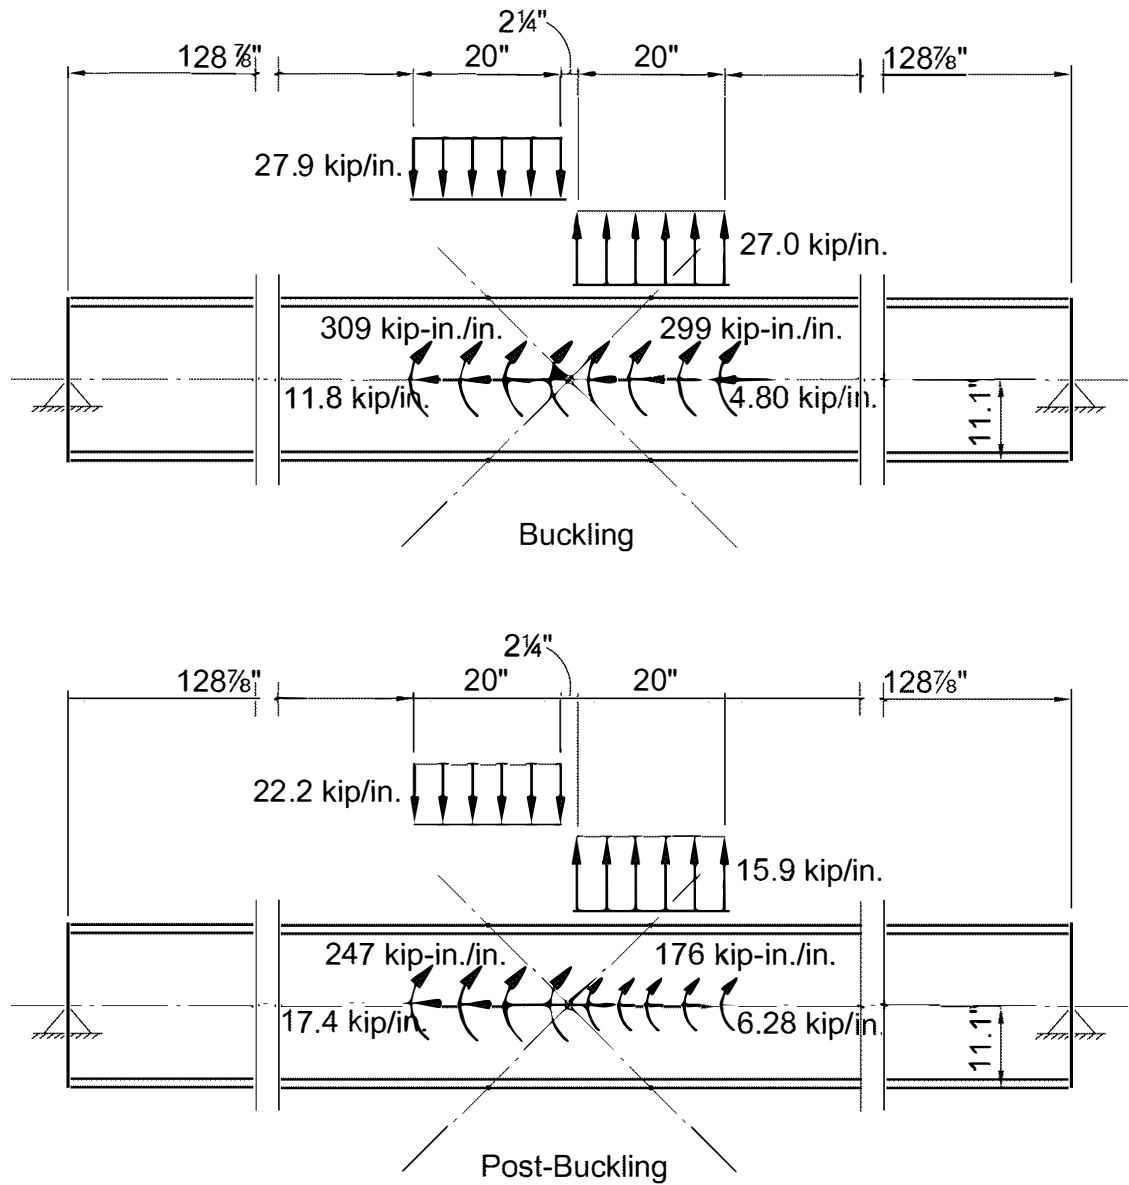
Gusset-beam interface forces/beam loading—LRFD.
